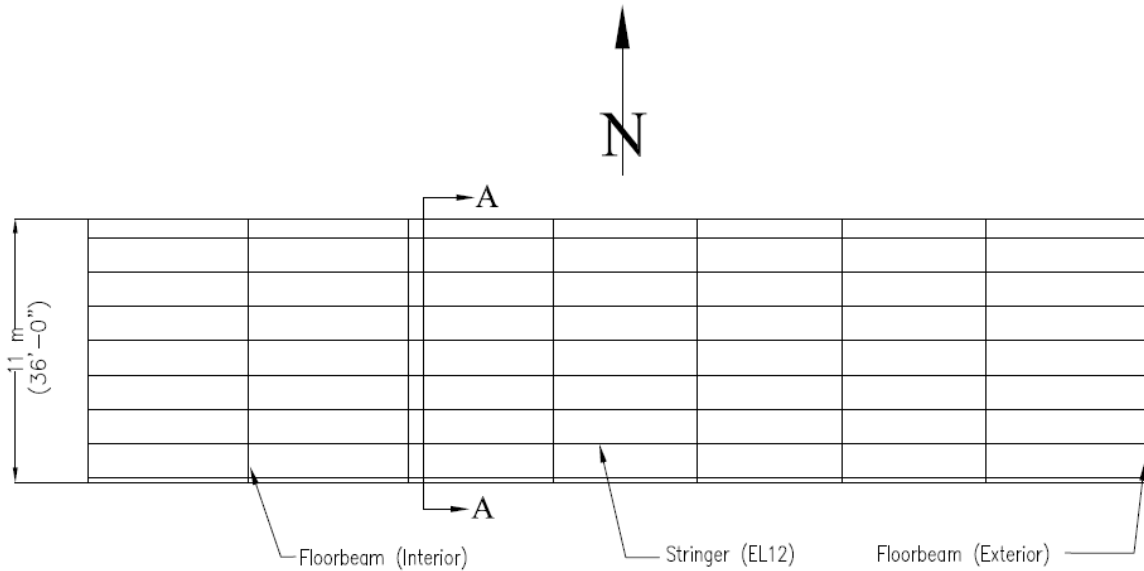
Framing Plan, Beech Creek Veterans Memorial Bridge
